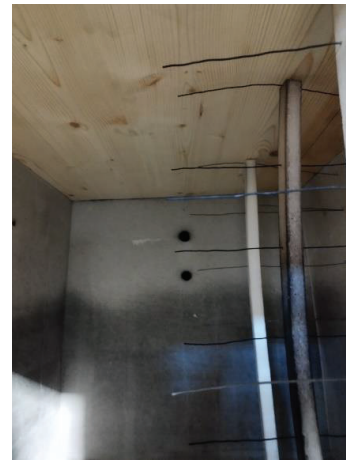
Inner view of CLT panel, installed at the compartment ceiling.
